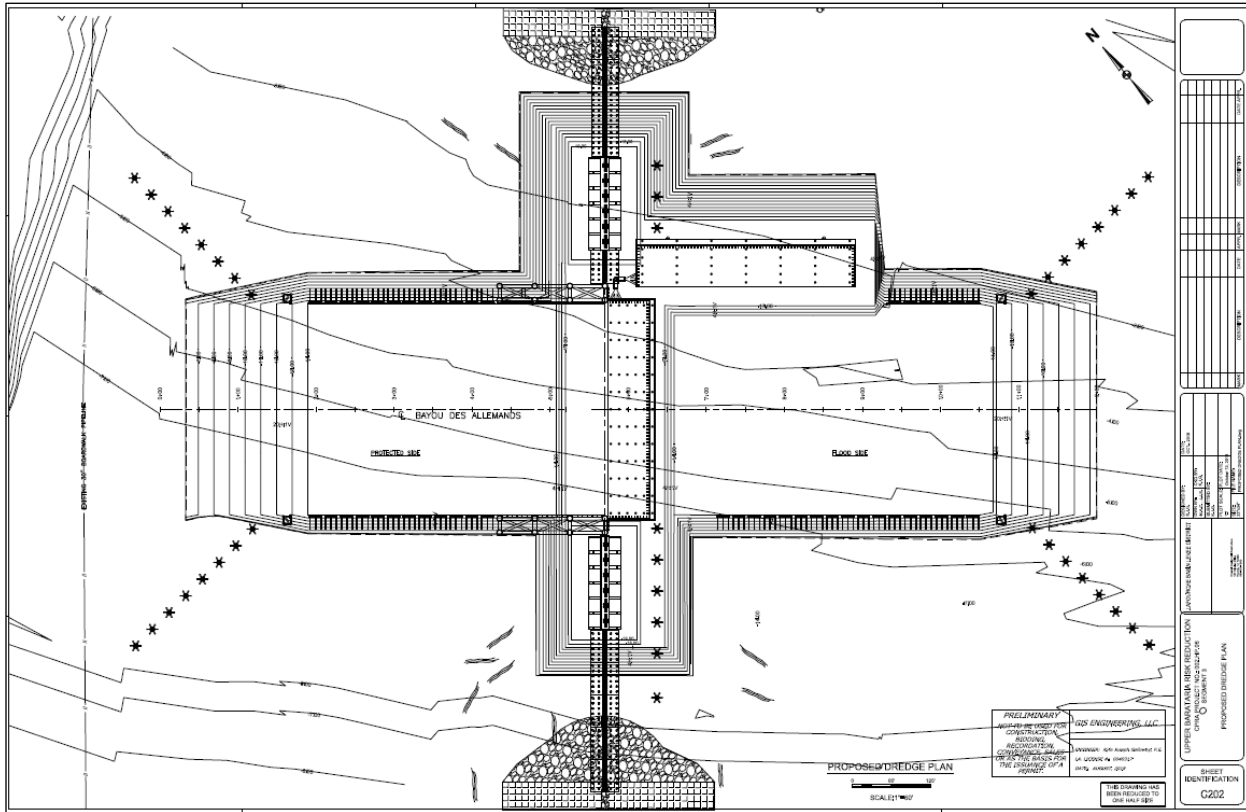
Floodgate Structure at Bayou Des Allemands
